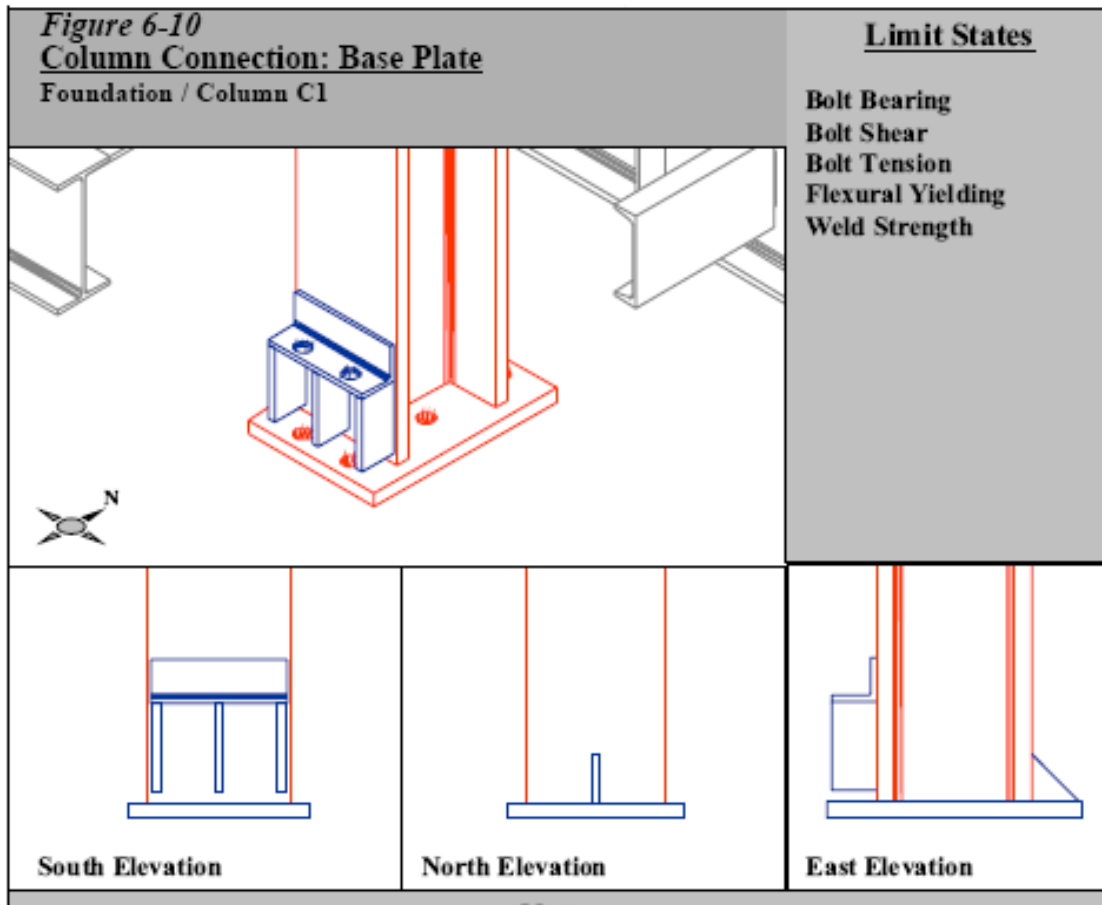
Column Connection: Base plate Foundation / Column C1
